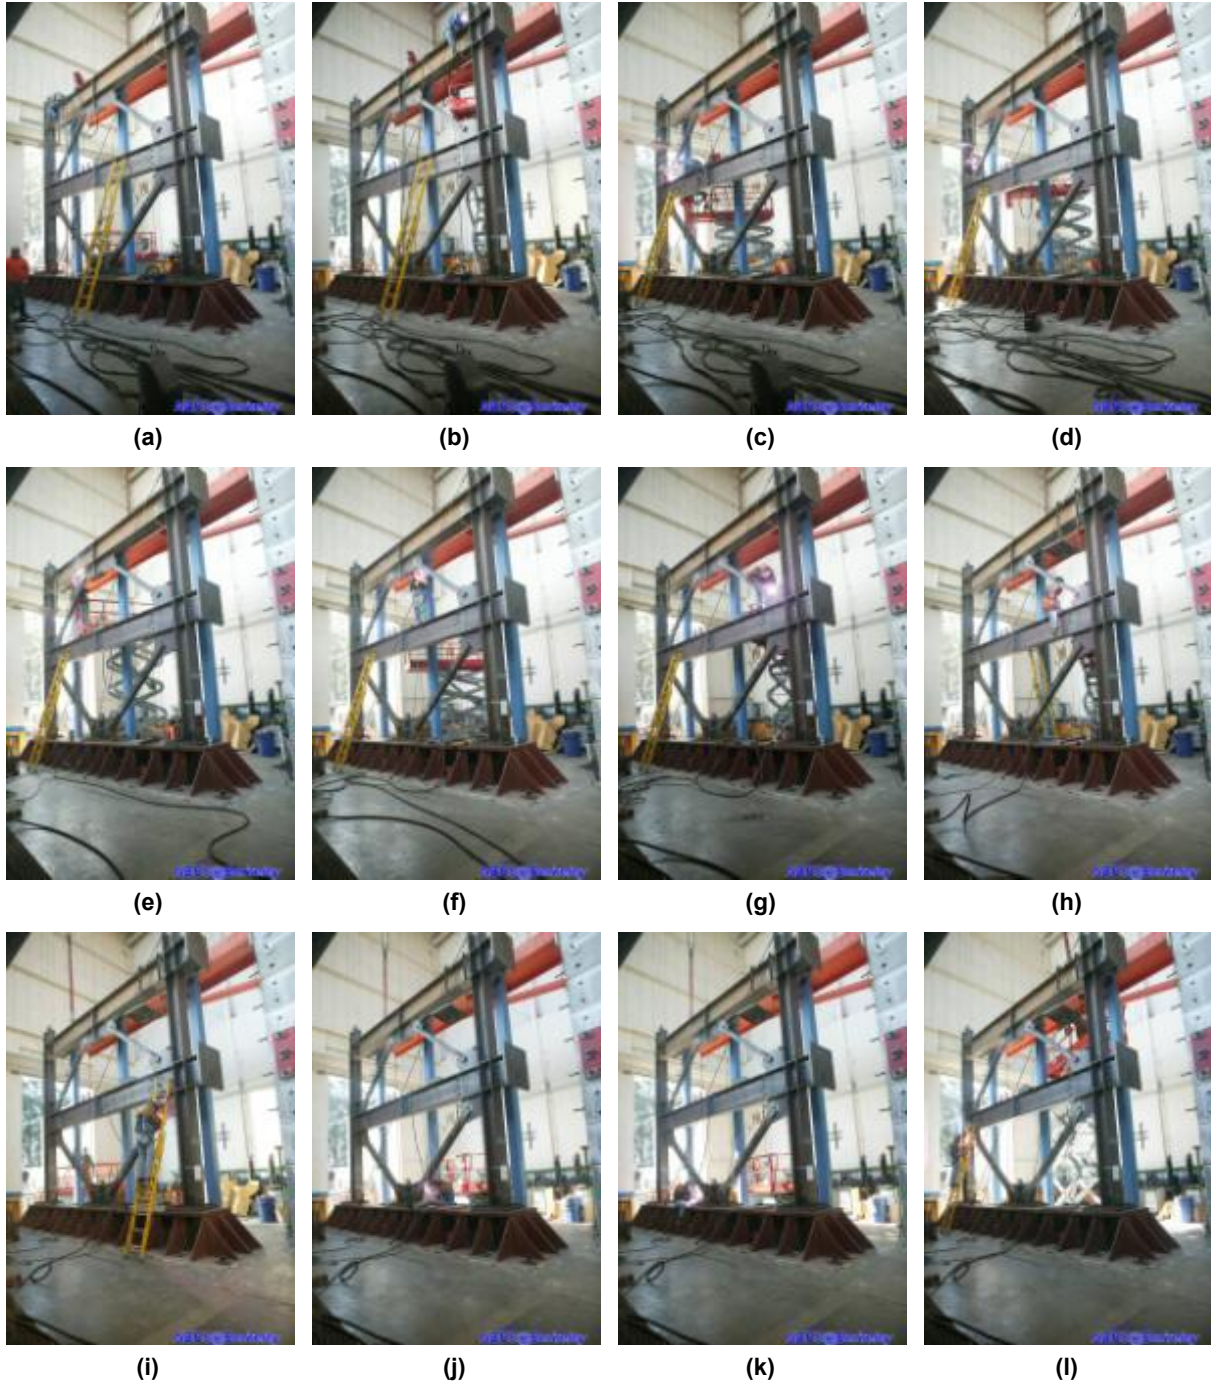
Specimen TCBF-B-1: key welding processes.
